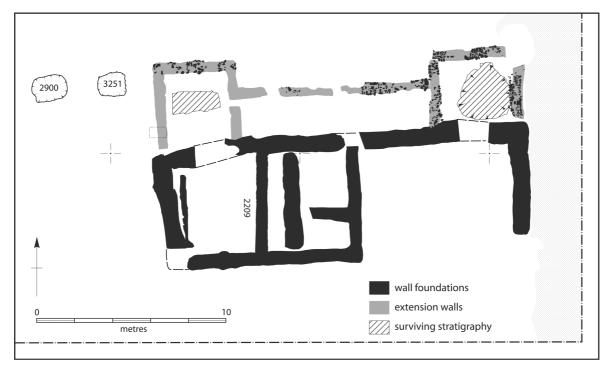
Plan of Building 1 extended, early fourth century (Phase 3)
